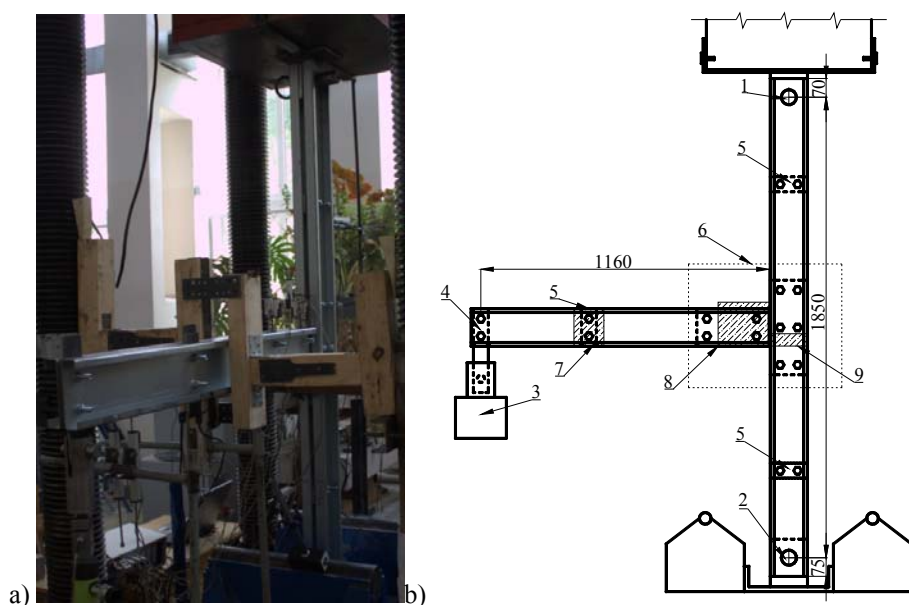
General view of joint laboratory investigation a) and scheme b): 1 – pinned connection of the top of the column; 2 – rolling support of the bottom of the column; 3 – jack screw; 4 – load additive point; 5 – gaskets between elements; 6 – joint region; 7 – lateral restraint for beam; 8 – lateral restraint for gusset plate; 9 – lateral restraint for column
